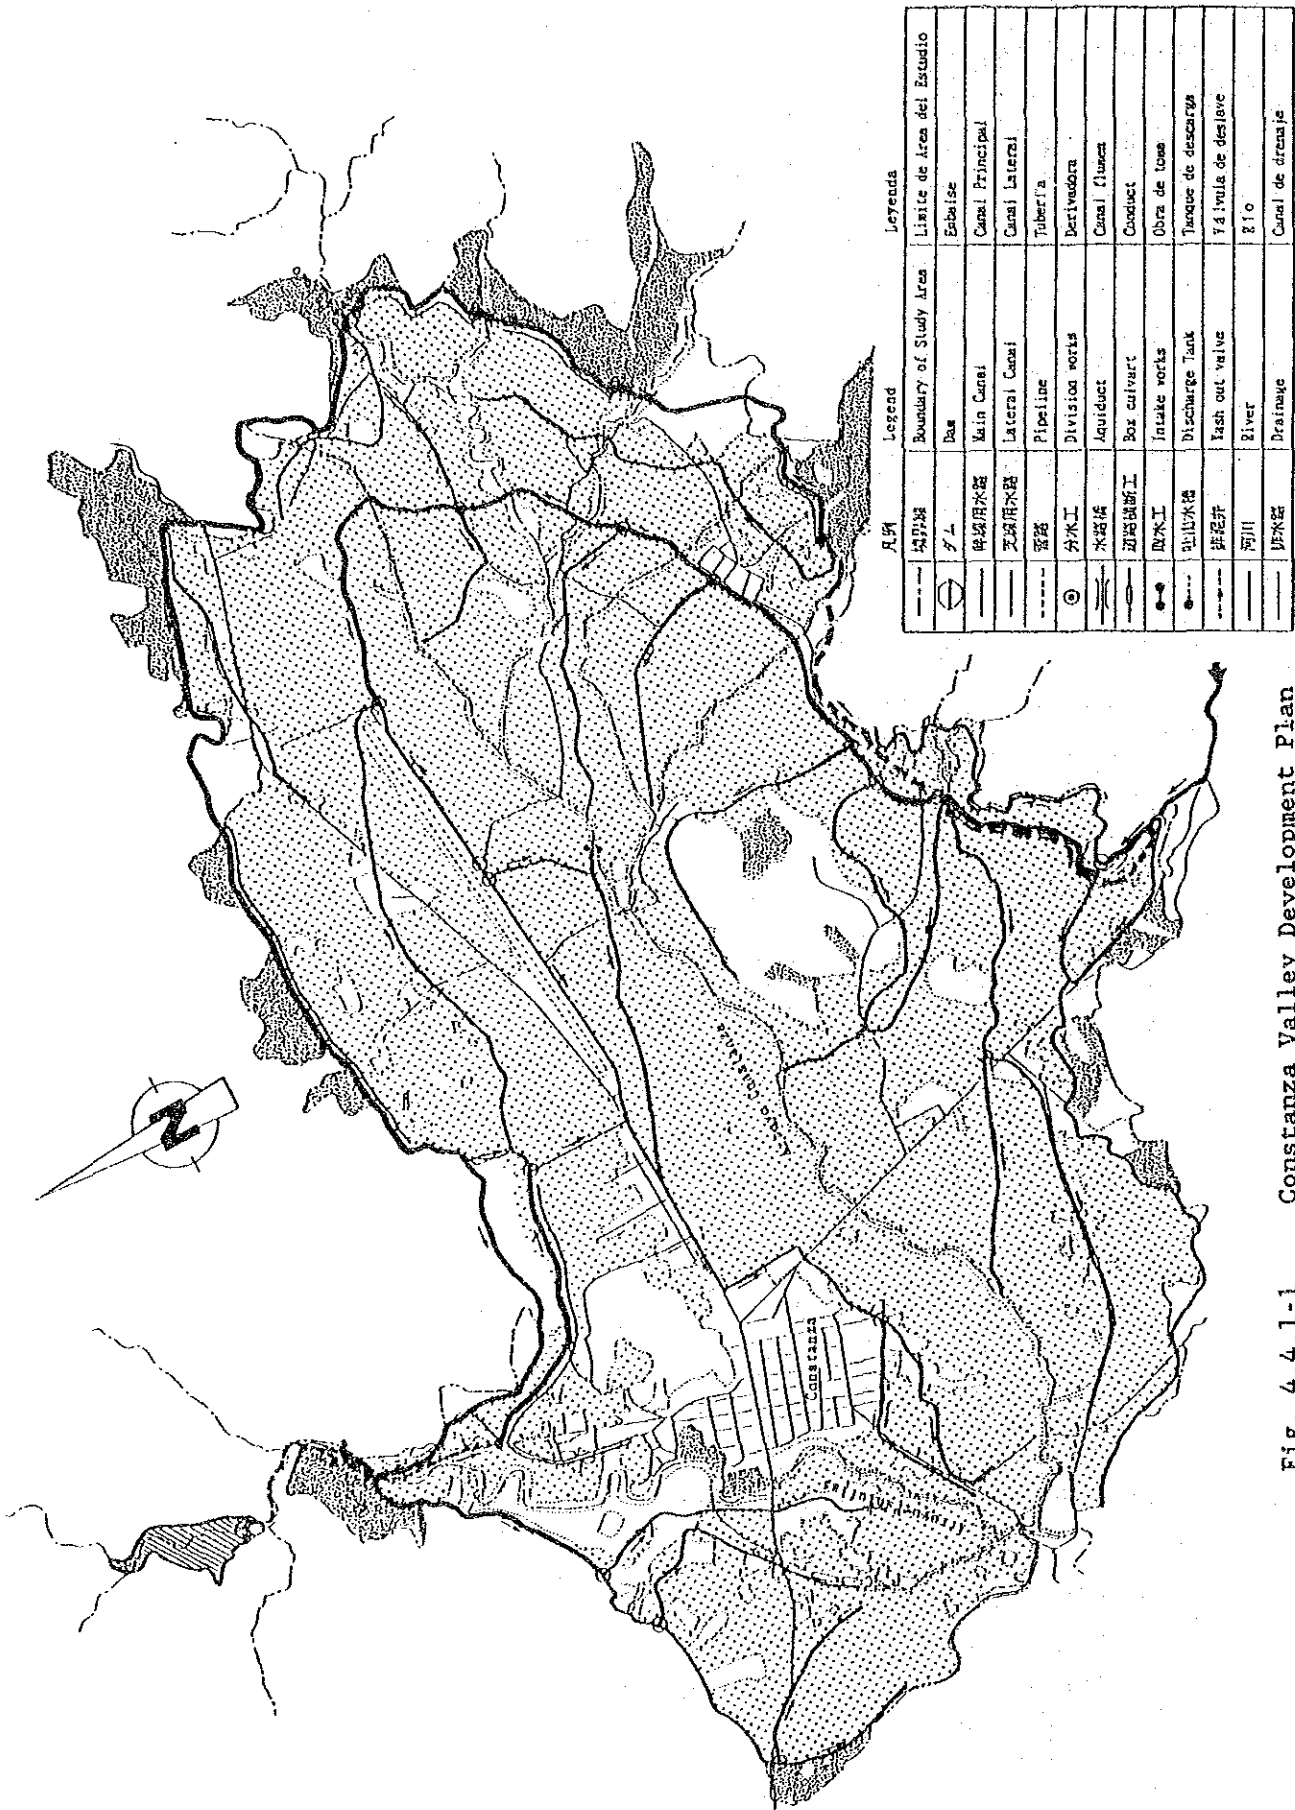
Constanza Valley Development Plan
